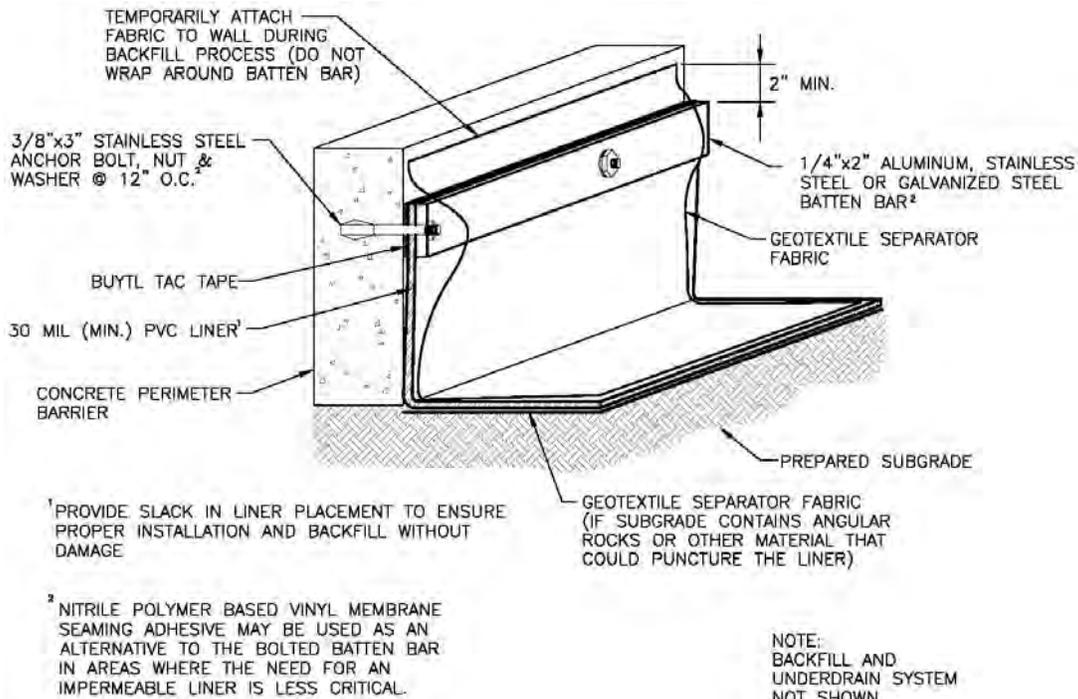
Geomembrane Liner/Concrete Connection Detail
